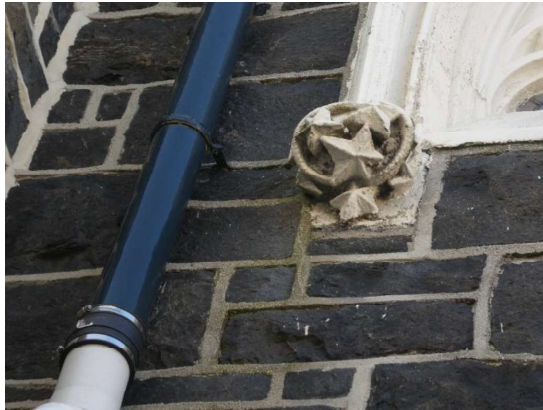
Showing typical pinnacle detail to the northern elevation.
